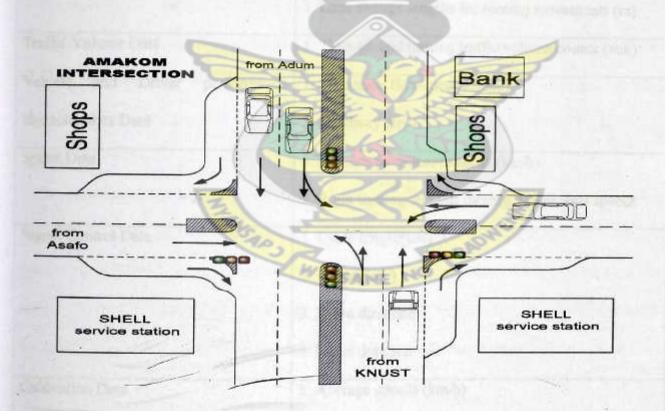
Geometry of 24th February/ Yaa Asantewaa Road Intersection LTRRARY
